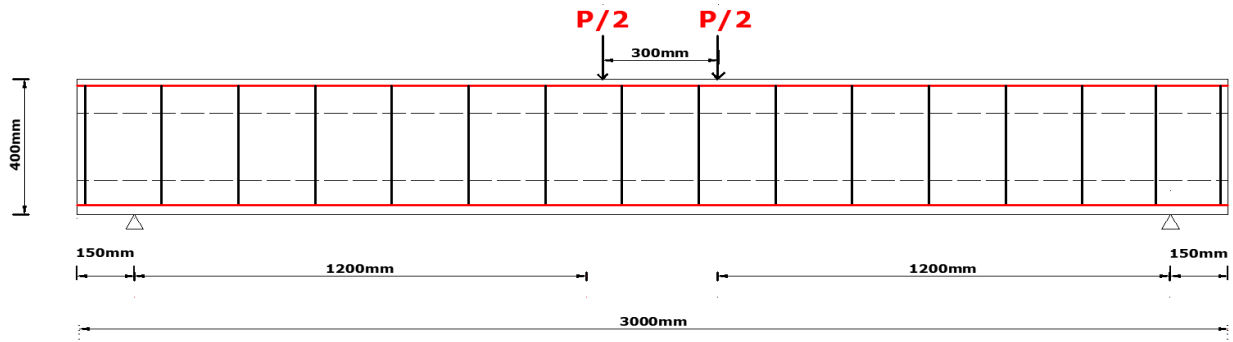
Geometrical dimensions, reinforcement details, and loading conditions of a typical test specimen.
